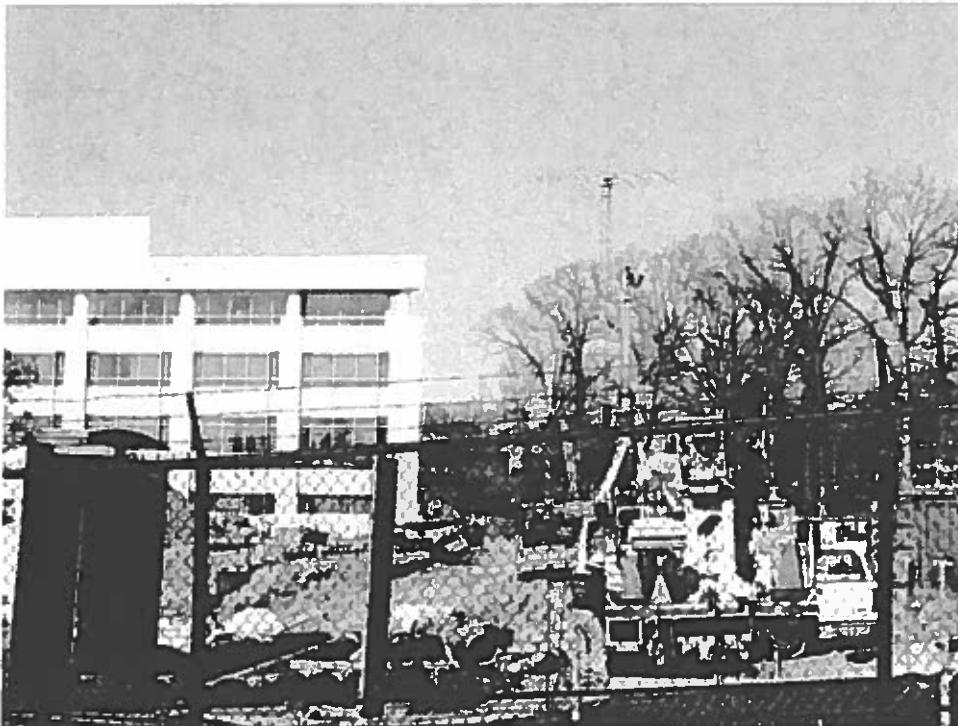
South Side View (State Department's Property Walk Way - Corner)
